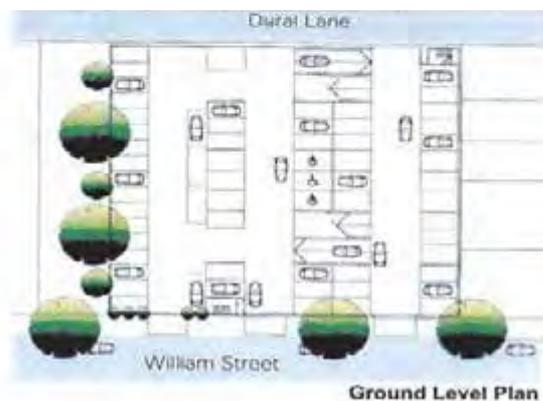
(s): West Precinct public car parking concept plan.(E)
